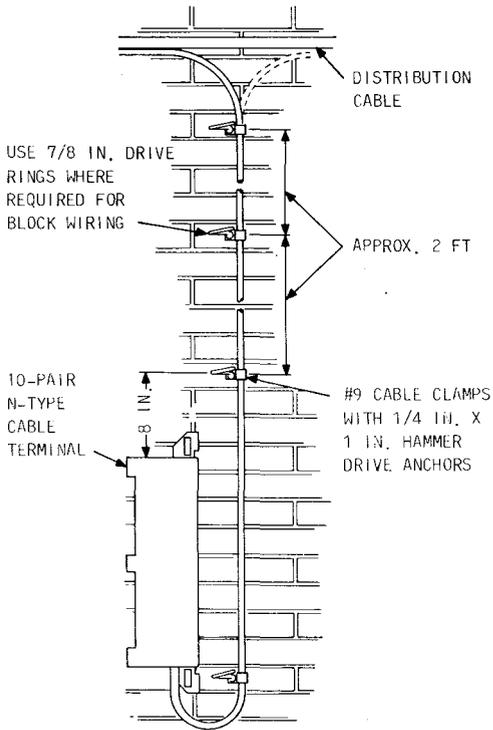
Vertical-Mounted Terminal Below a Horizontal Cable Run
